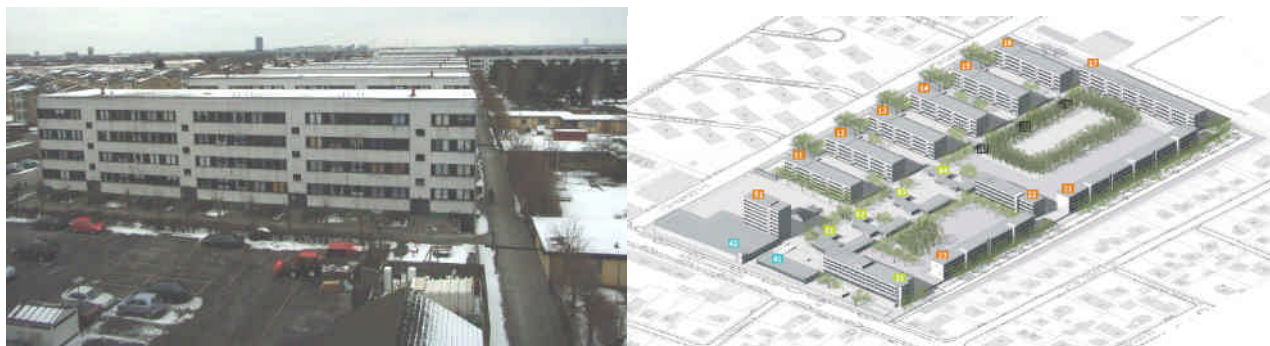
Denmark, the three building blocks used for DEMOHOUSE renovation, 3D-view of Gyldenrisparken.
